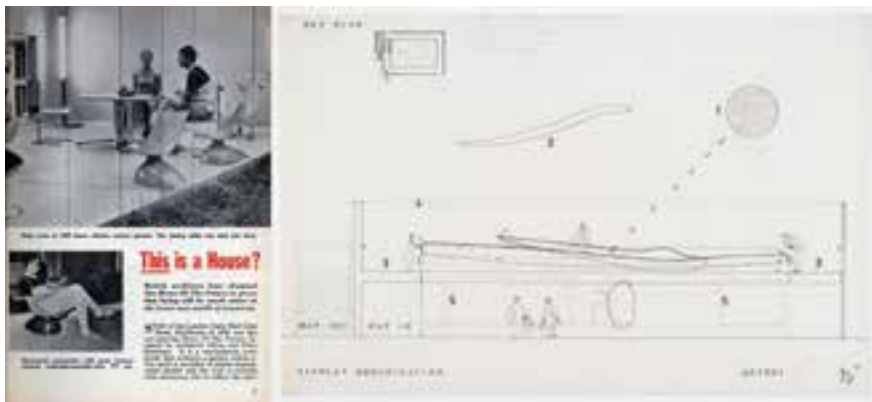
Left: “The House of the Future”, *Mechanix Illustrated*. Source: shorturl.at/xJLV4. Right: Plan and section showing circulation of exhibition viewers. Source: shorturl.at/lmoN2
